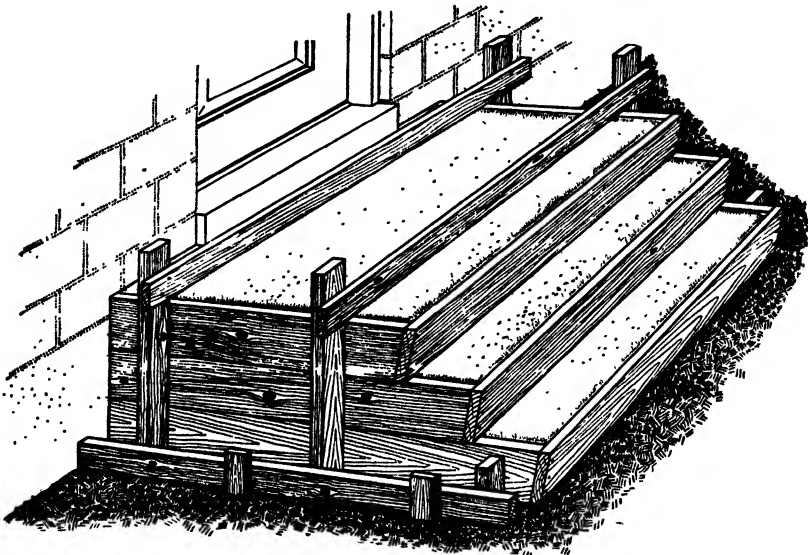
Simple forms for building concrete steps. (Portland Cement Association)
